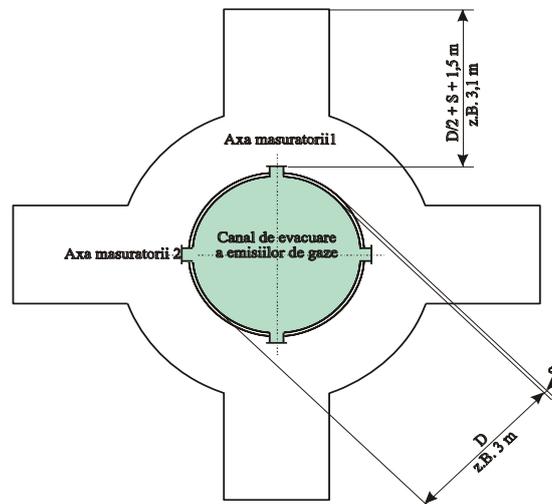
Model of measurement field from a perpendicular residual gas shaft, with 2 measuring axes and 4 measuring openings for performing crossing measurements
